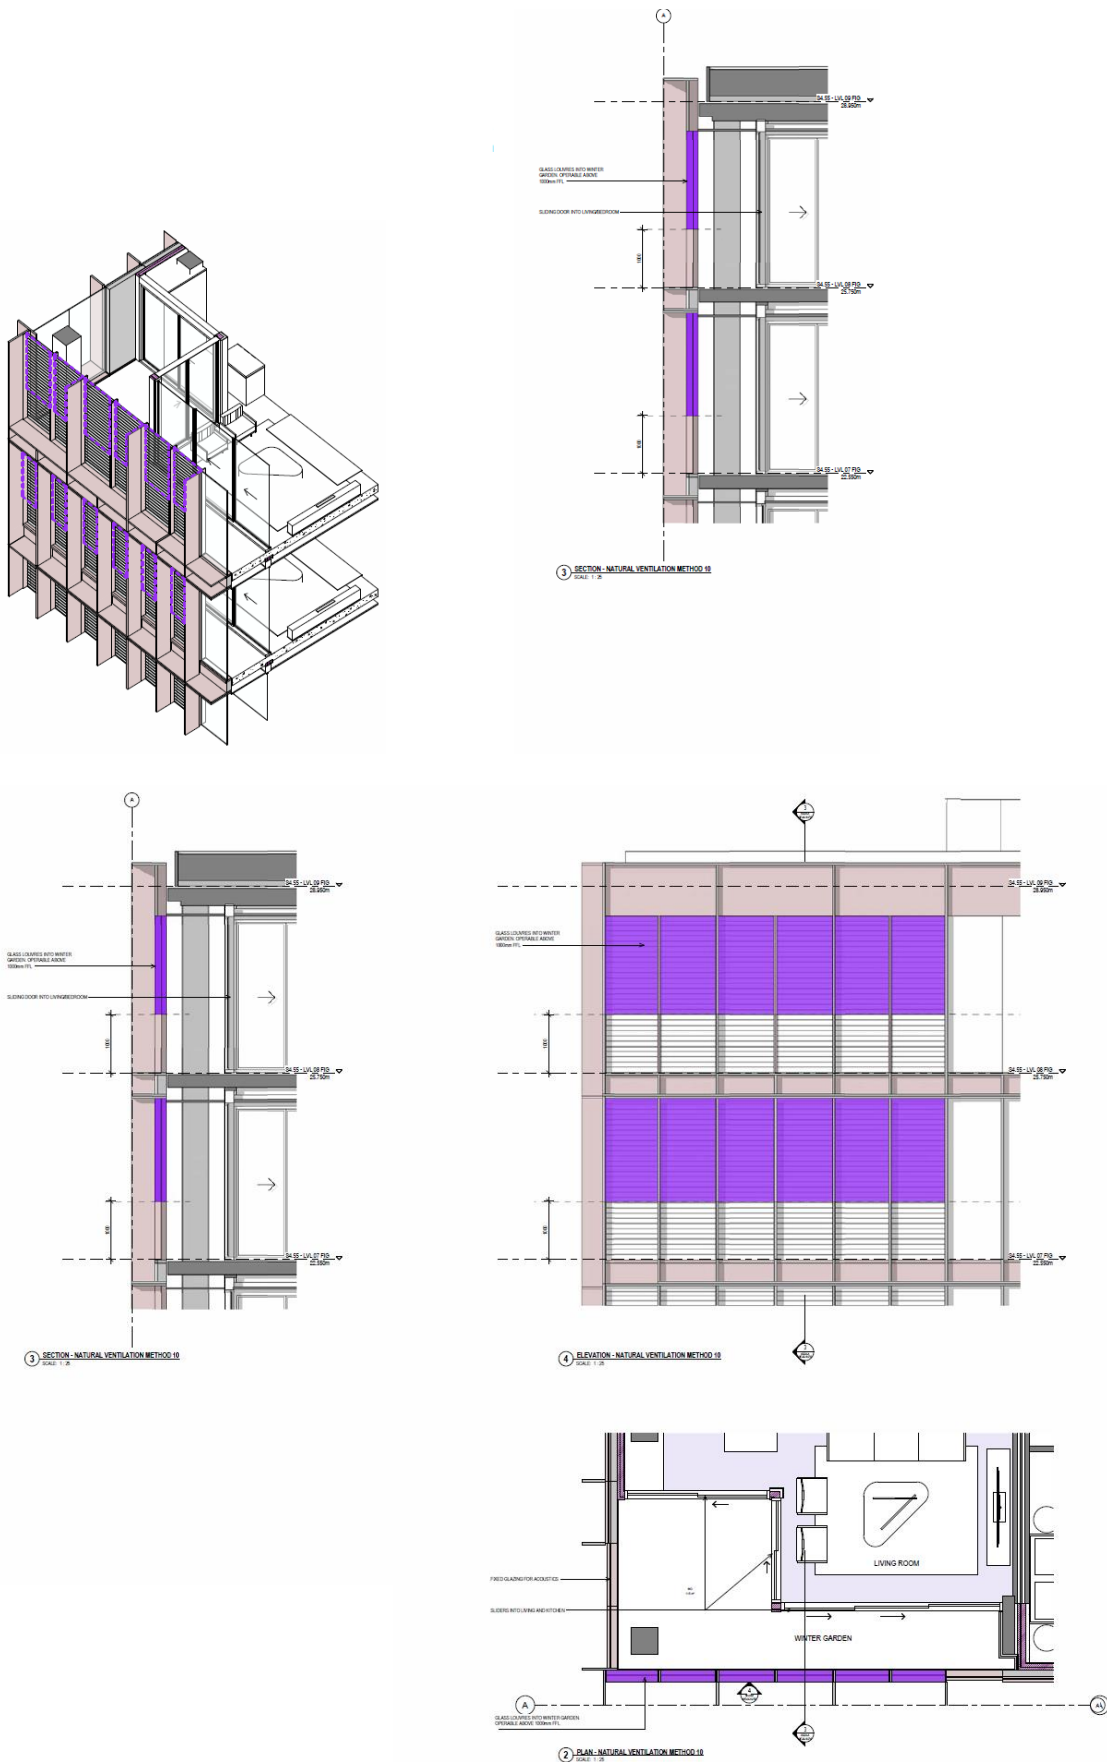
Natural ventilation - acoustic solution example: Wintergardens East/West Elevations
